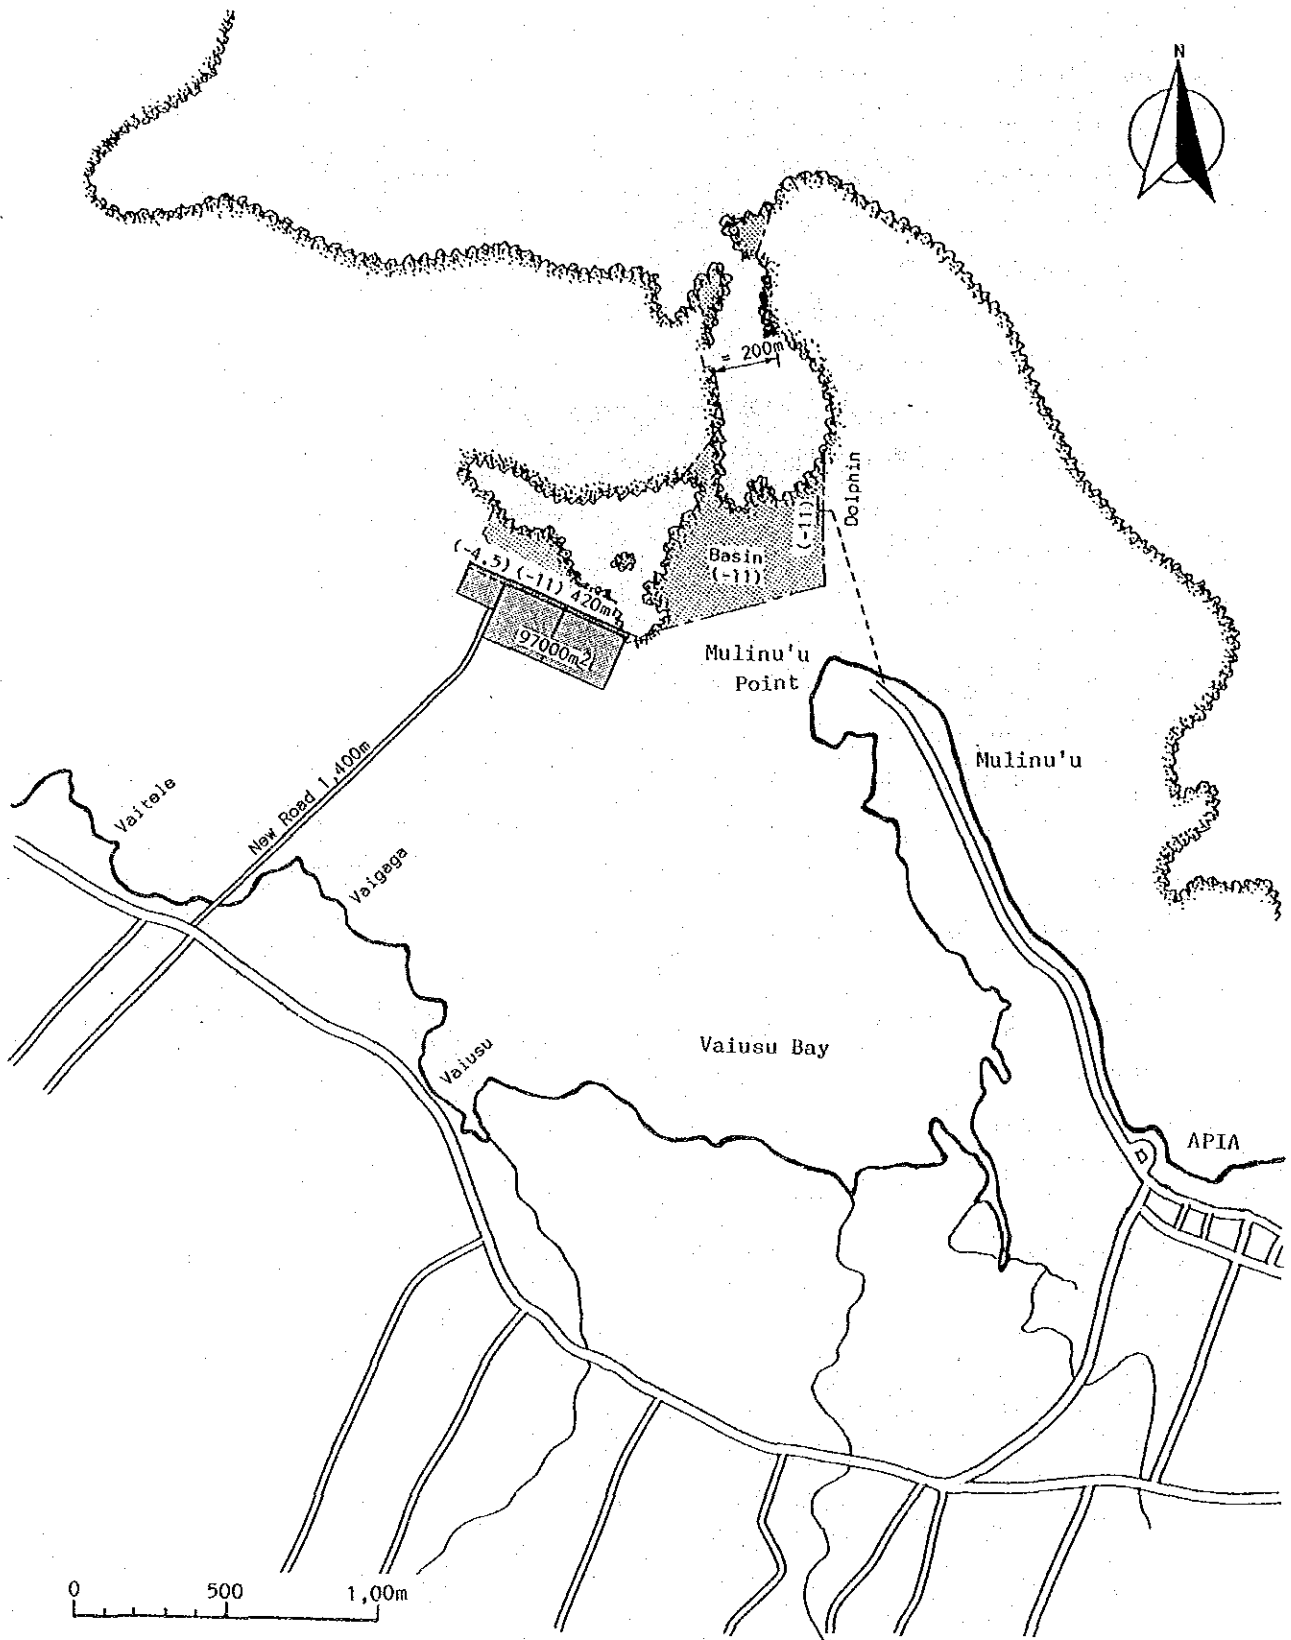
Layout of the Port Facilities (Alternative 1)
